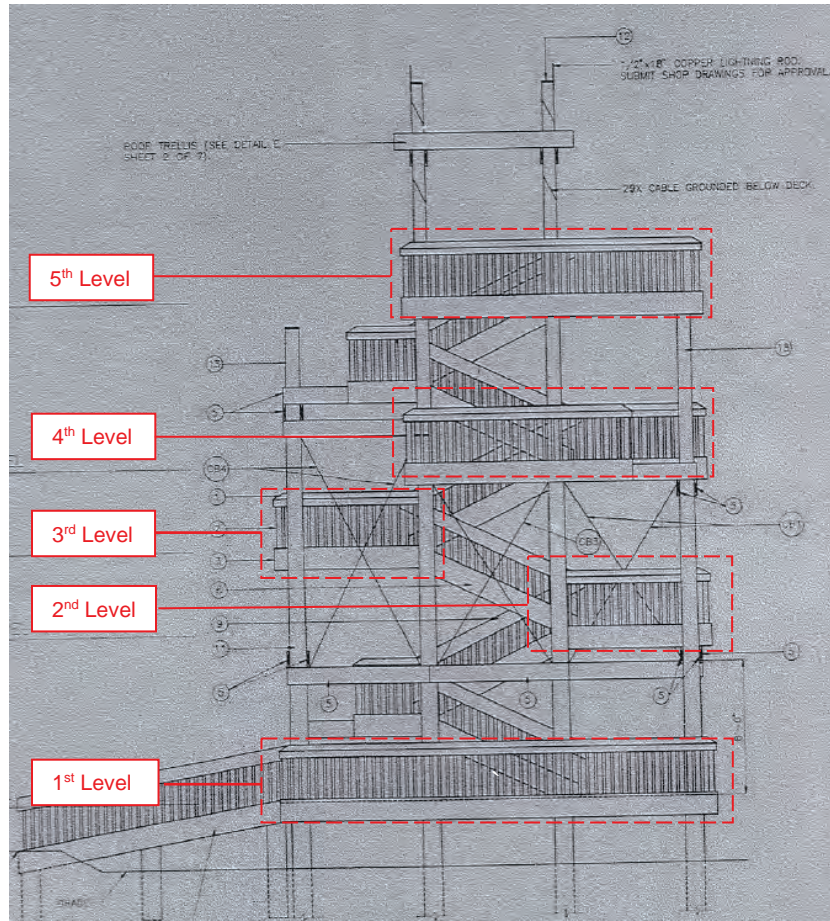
East Elevation of Observation Tower, 1994 Office of the County Engineer
